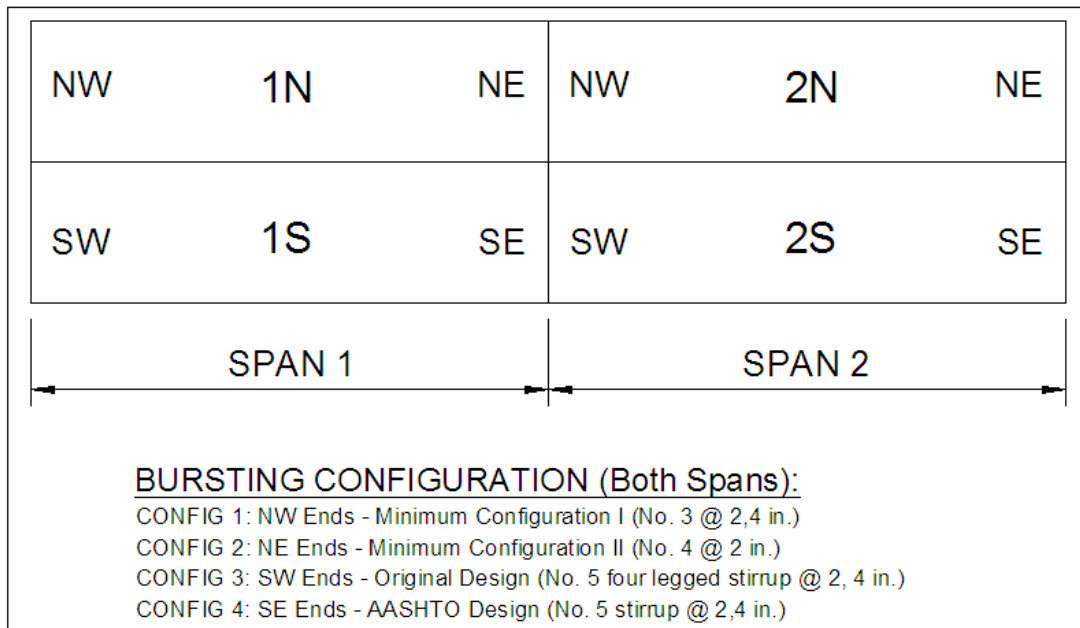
Bursting reinforcement details used in the Concept 1 laboratory specimen. Configuration numbers correspond to the discussion on bursting in Section 4.5
